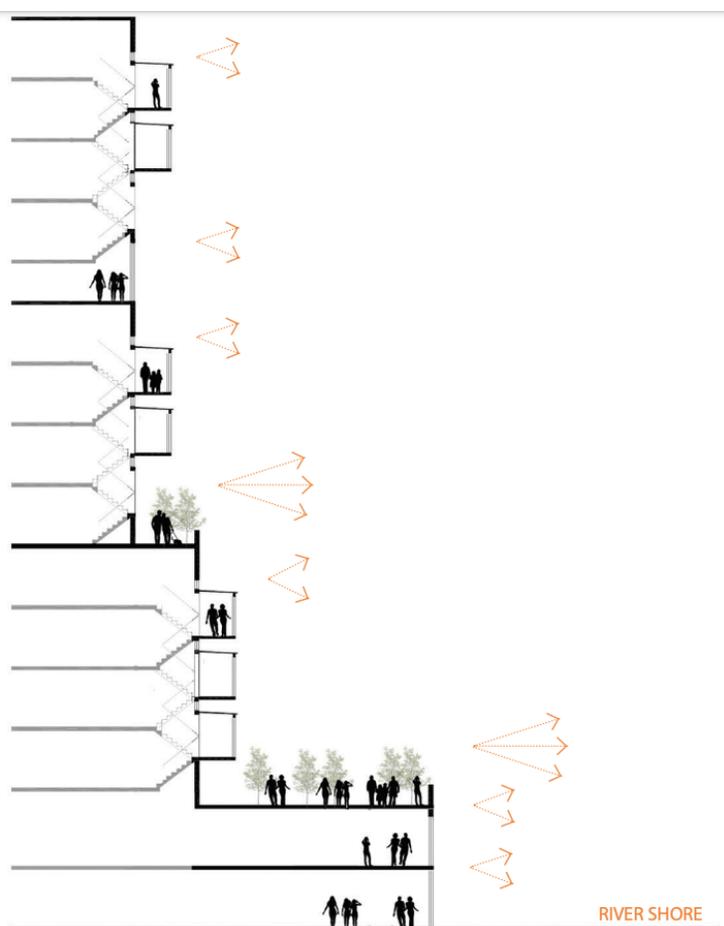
Tall buildings' visual access to the Los Angeles River can be maximized through innovative massing techniques, higher levels of transparency, or commonly accessible patios
